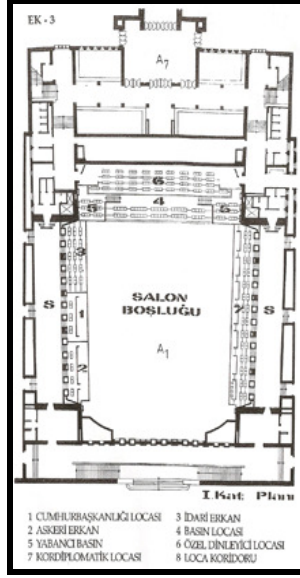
18 Upper Floor Plan of Original General Council Hall
